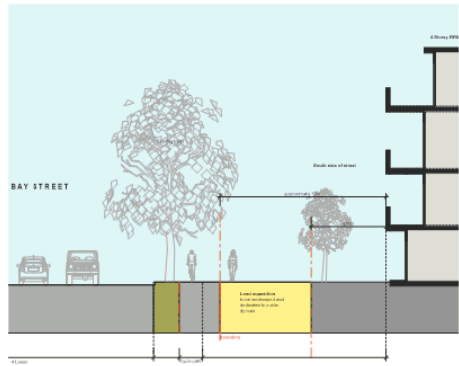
INDICATIVE TYPICAL SECTION (EXISTING ROAD RESERVATION)
